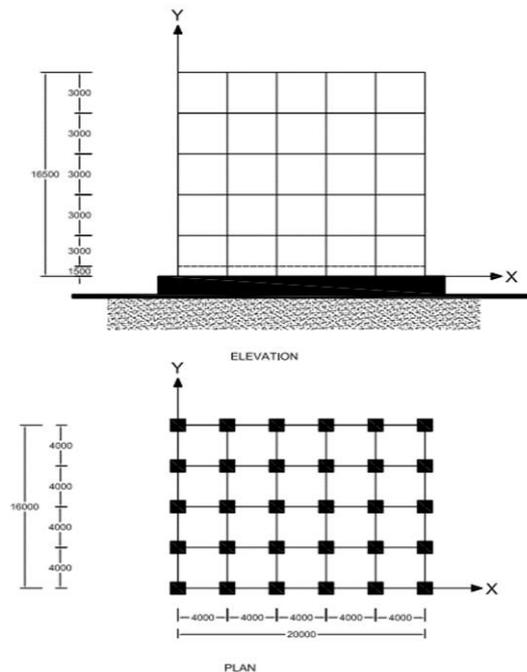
Five-storey Benchmark Building: Elevation and plan of benchmark building showing the structural moment frame grid (all dimensions are in mm).
